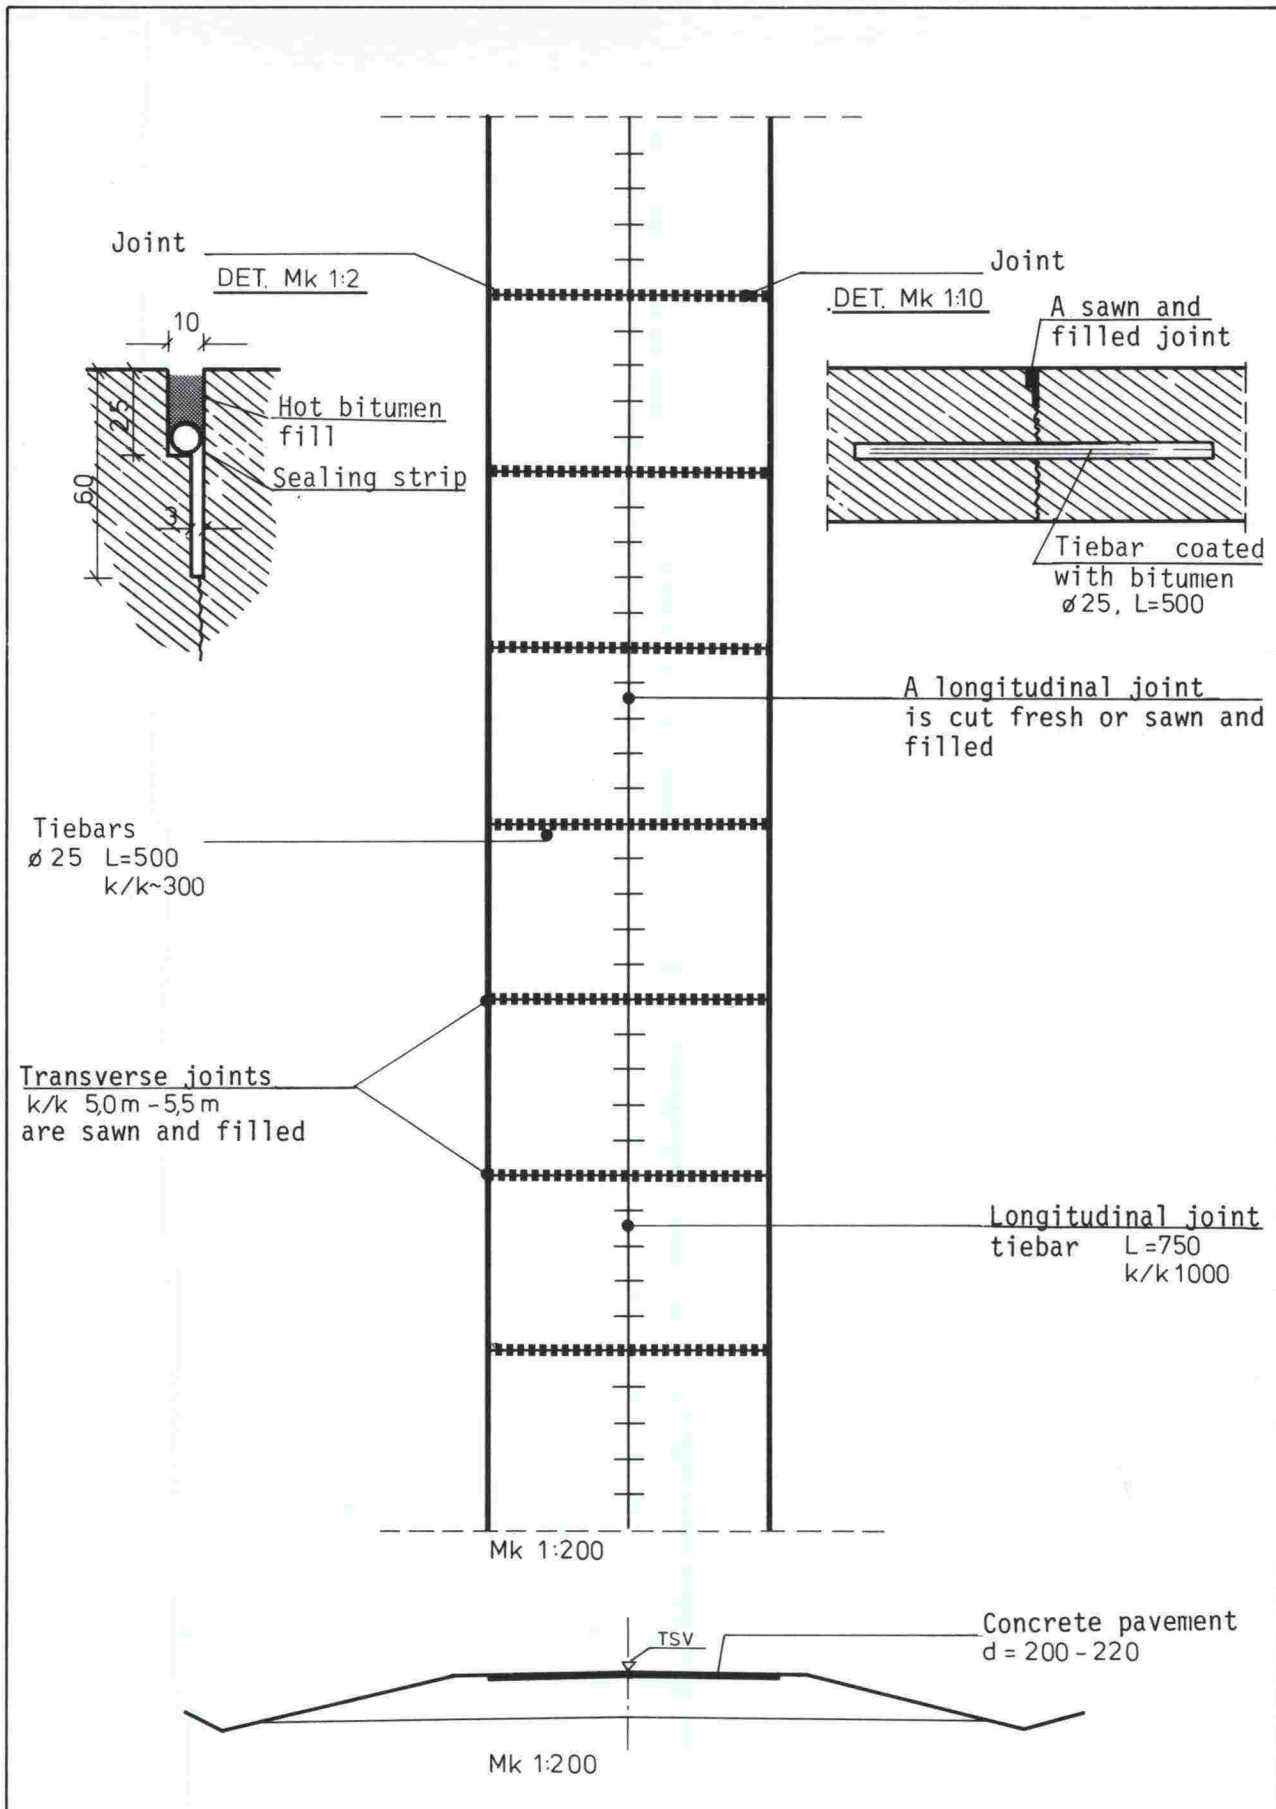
An unreinforced concrete pavement equipped with dowel bars, a principal structure
